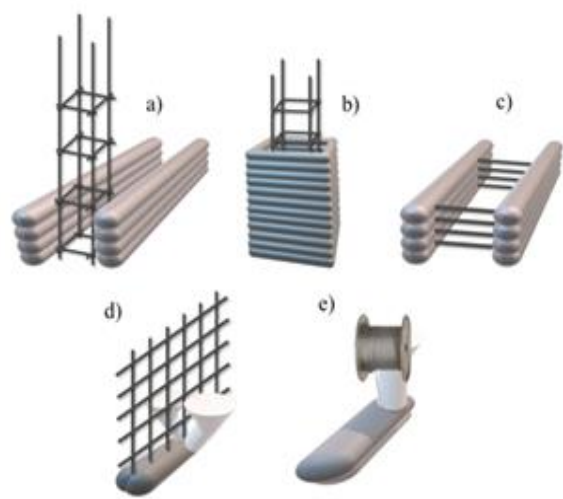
Designs of structures for printing: a, b) channels with vertically-positioned steel reinforcements; c) channel supported by horizontally-positioned steel reinforcements; d) wall supported by a pre-fabricated steel grid with laying concrete at both sides and e) layers reinforced with a flexible steel cable inserted during printing using a spool-like device [14].
